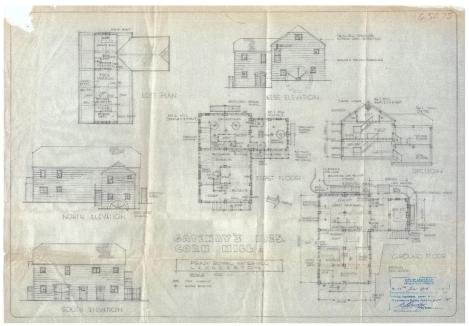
building plans of a replica 'working' corn mill date stamped 1975.
